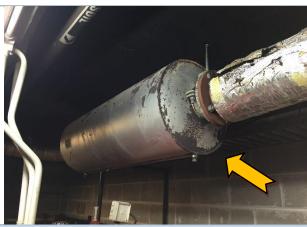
Interior: all levels throughout, pipe work – suspected SFM containing external insulation.
